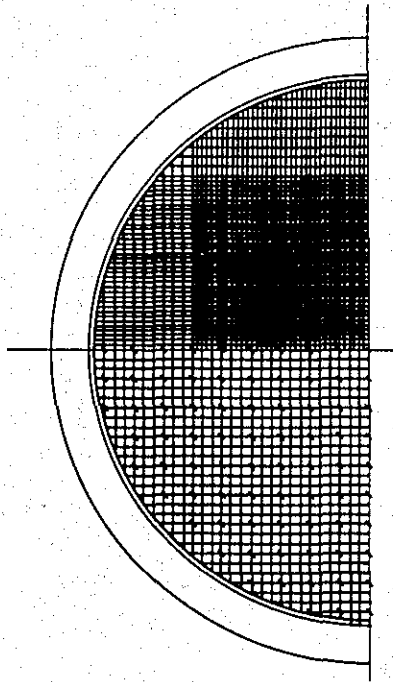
Arrangement of Reinforcing Bars of Top Slab
